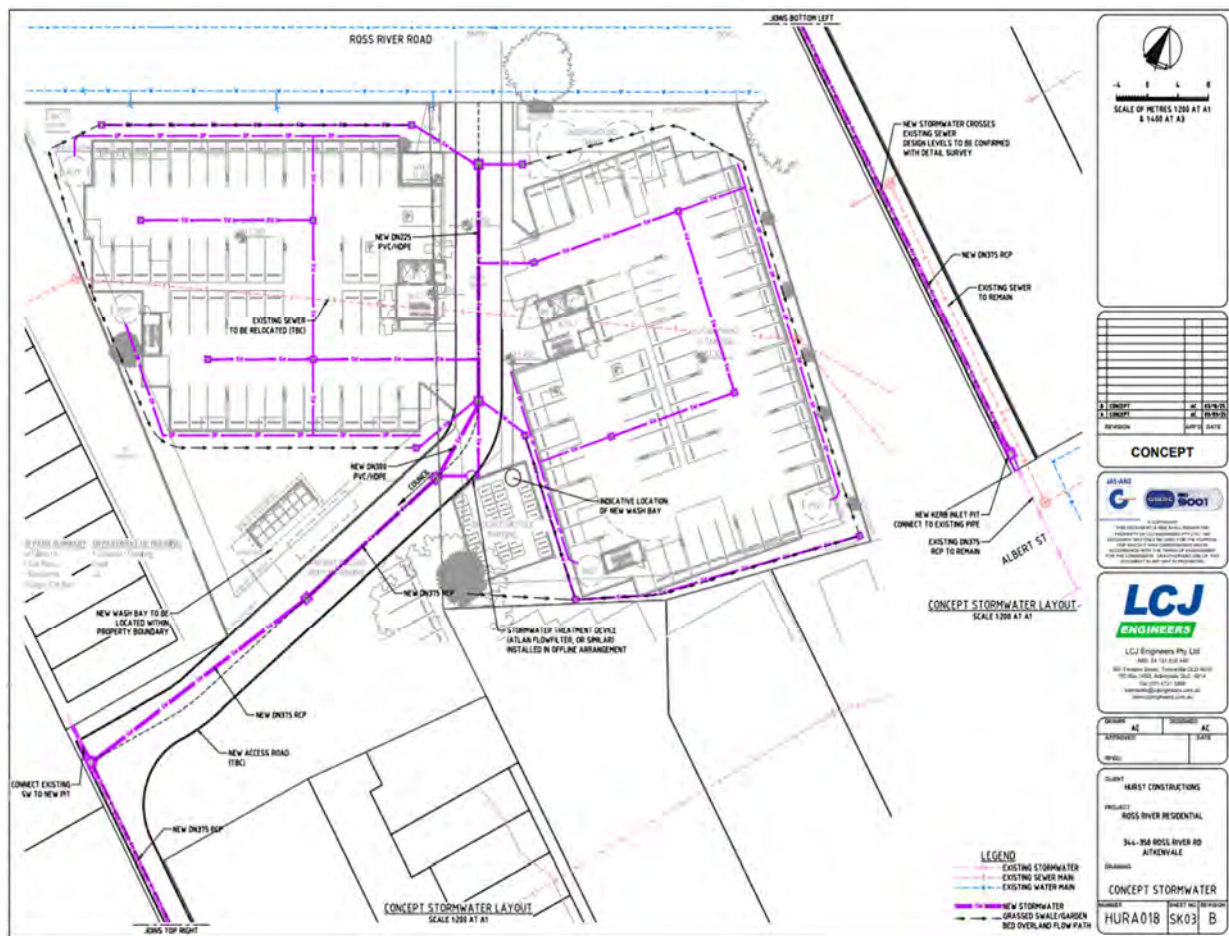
Concept Stormwater Layout from the Stormwater Management Plan (LCJ, 03/10/25)
